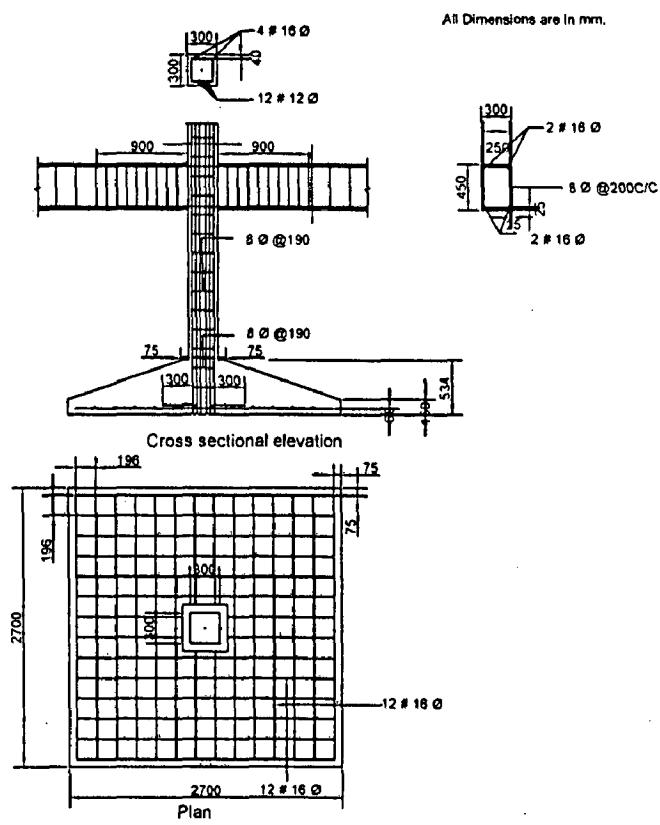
Details of column and footing reinforcement of interior frame for Zone II
